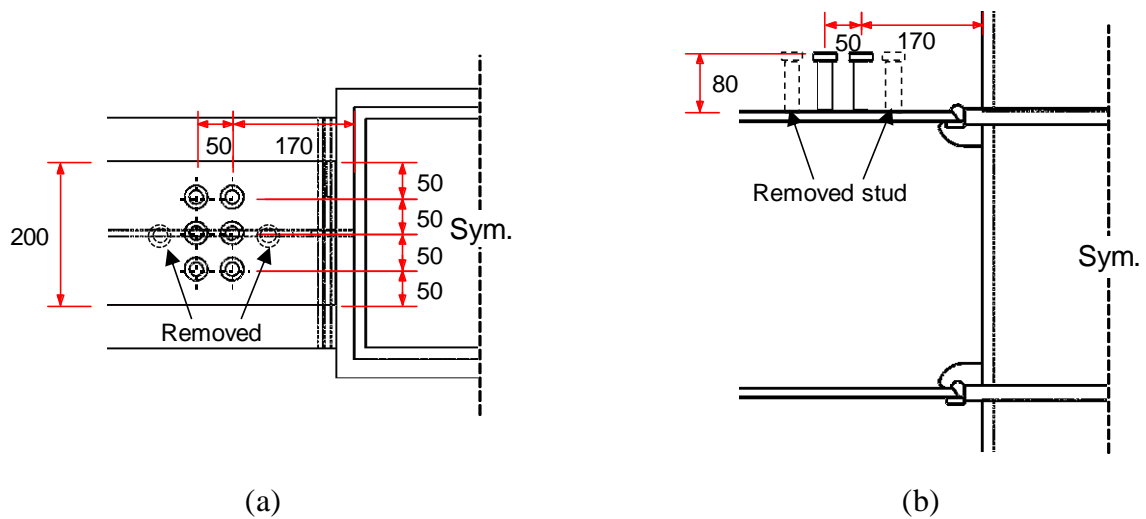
Studs in SFRCC slab: (a) Plane view; (b) side elevation (unit: mm)
